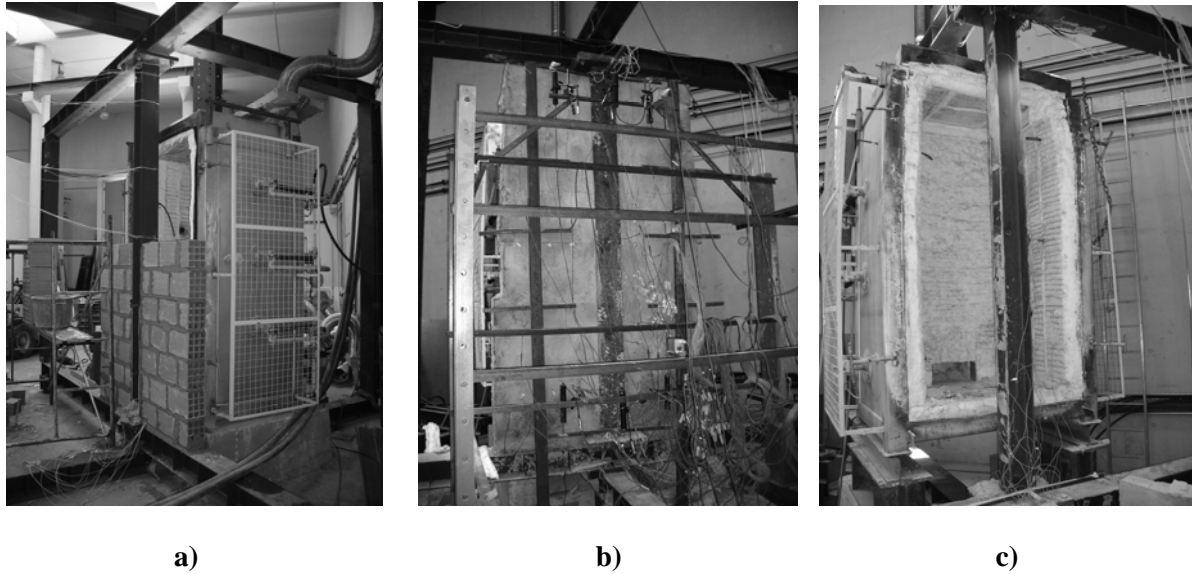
a) Construction of the test model, b) Column embedded in the wall, c) Column after test.
